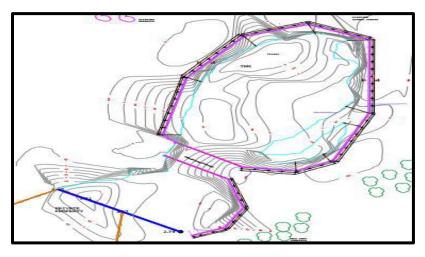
Layout of the Proposed Seawall Around Vasco Da Gama Site
